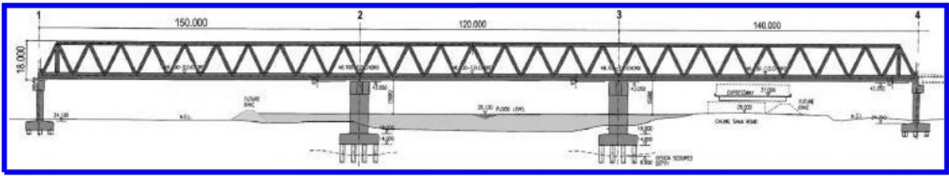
The steel bridge over the river near Taichung station of the Taiwan High Speed Railway.
